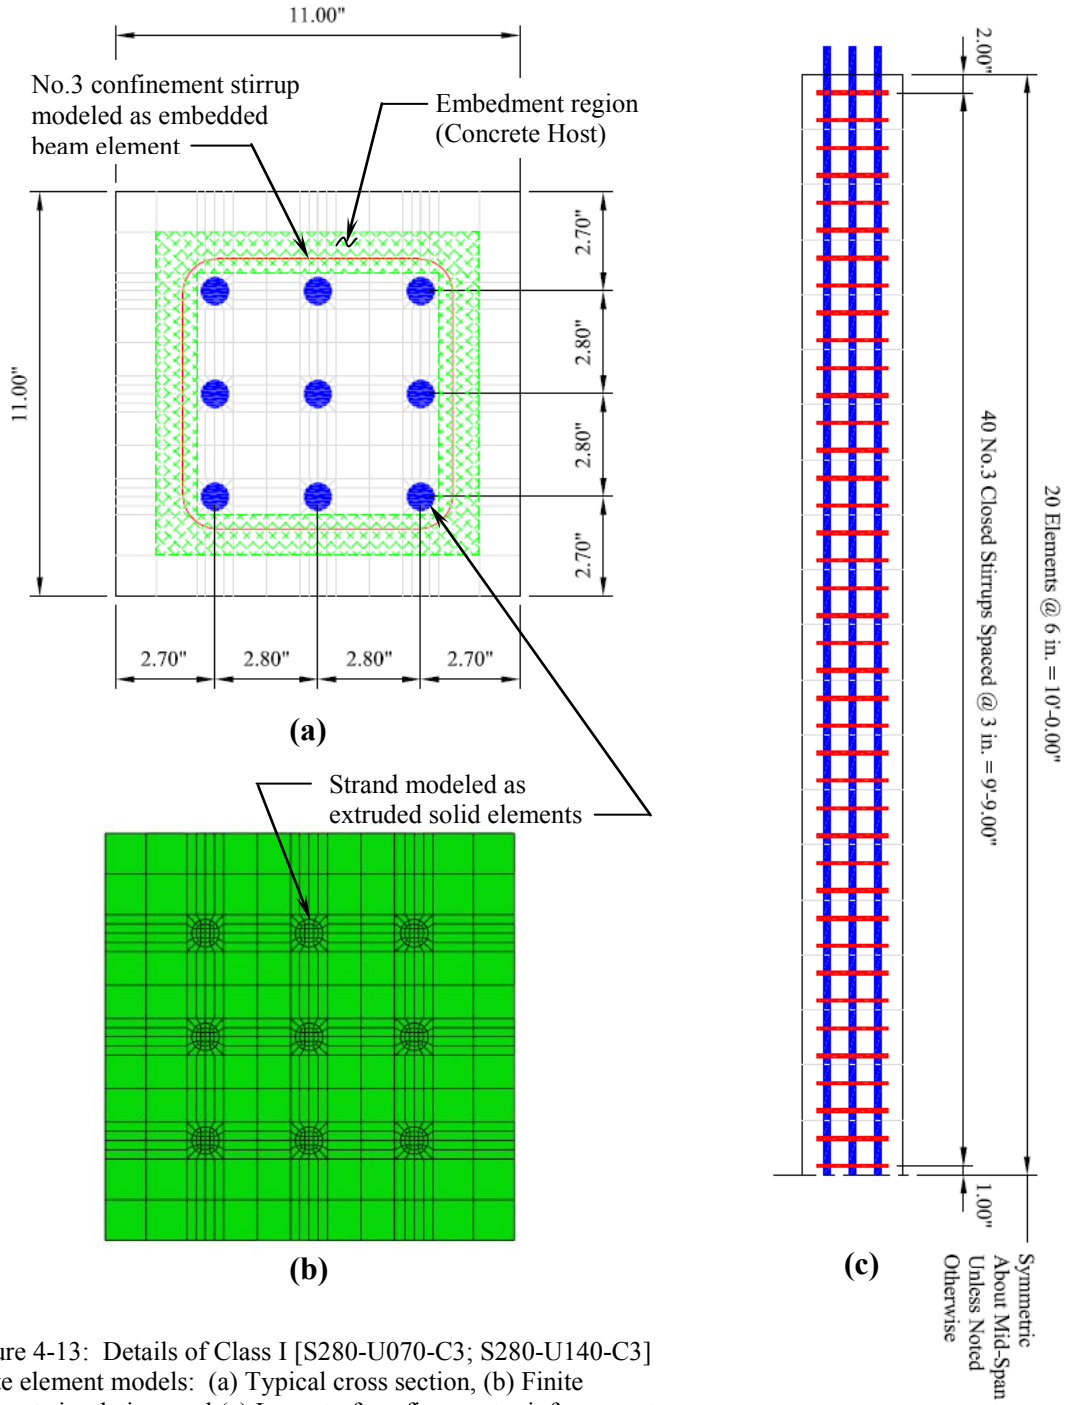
Details of Class I [S280-U070-C3; S280-U140-C3] finite element models: (a) Typical cross section, (b) Finite element simulation, and (c) Layout of confinement reinforcement (No.3 closed stirrups spaced at 3 in. on center)
